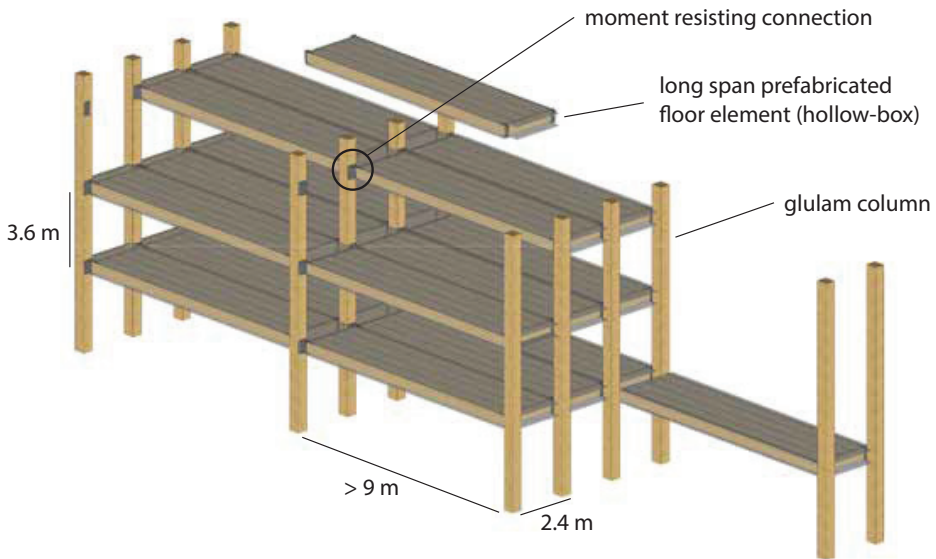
Concept of the Woodsol building system (Diagram adapted from SINTEF/Woodsol material).
